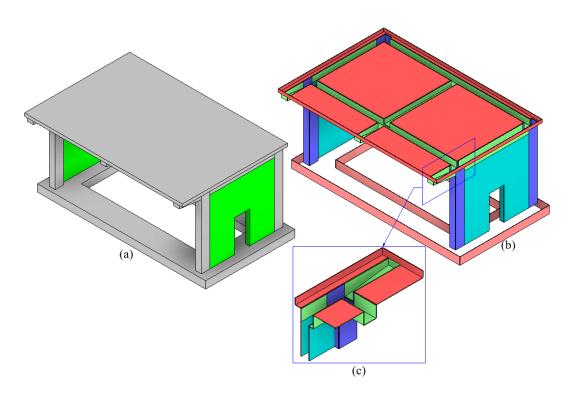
(a) RC structure for the case study. (b) Formwork view for the entire structure created by Revit Dynamo. (c) Formwork view for beam, column, and wall intersection
